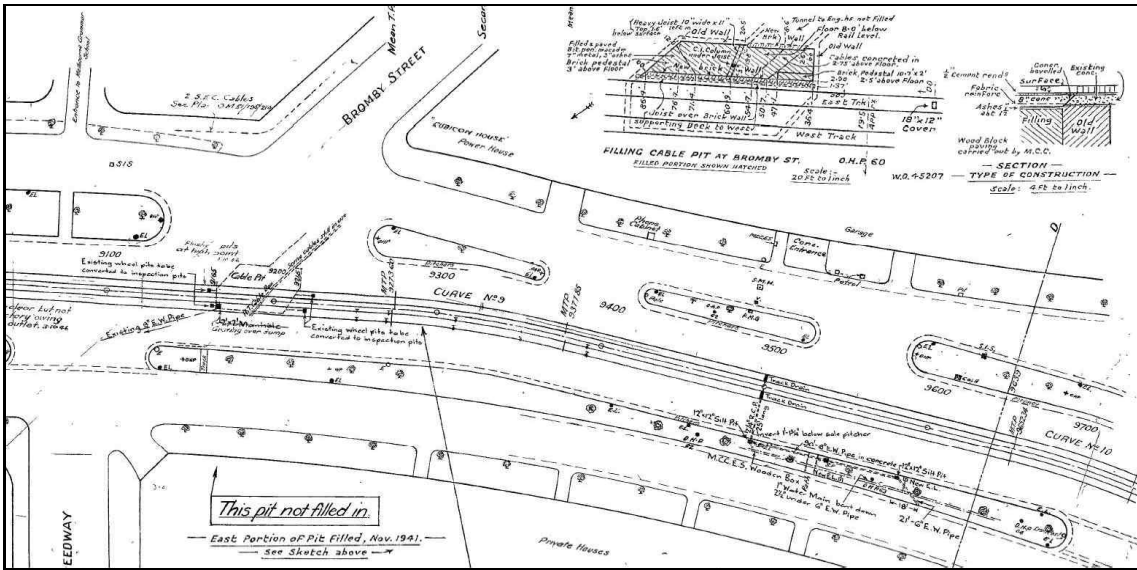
Melbourne and Metropolitan Tramways Board (MMTB) plans, June 1925 (PTV P411_039P)
